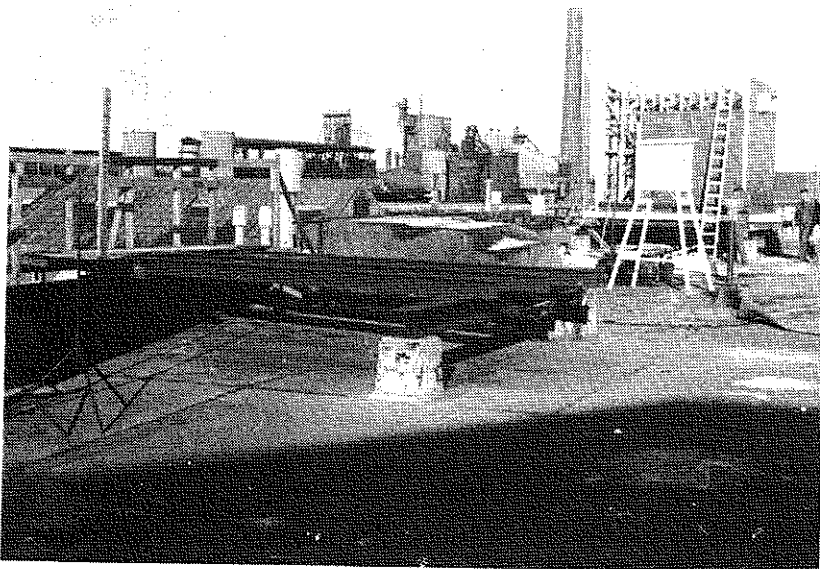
1968, autumn. 4+4 concrete supports, 0.4 by 0.4 m, height 0.5 m, just above existing building columns below the roof of the experimental hall, were cast and plated
